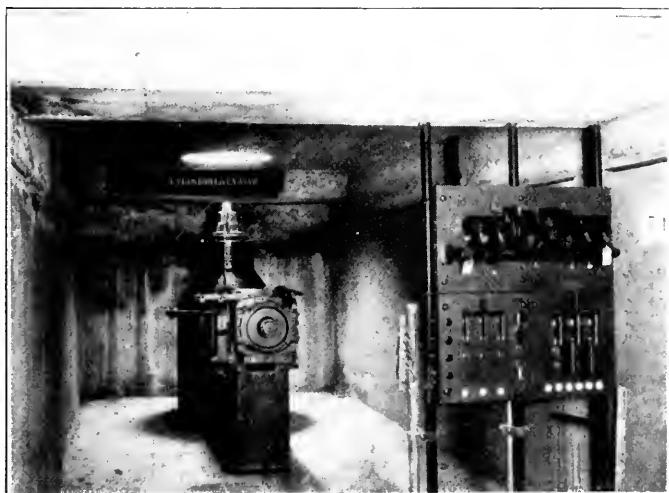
Typical Lock Machinery Room, Showing Control Panel, With Wiring Partially Completed.
